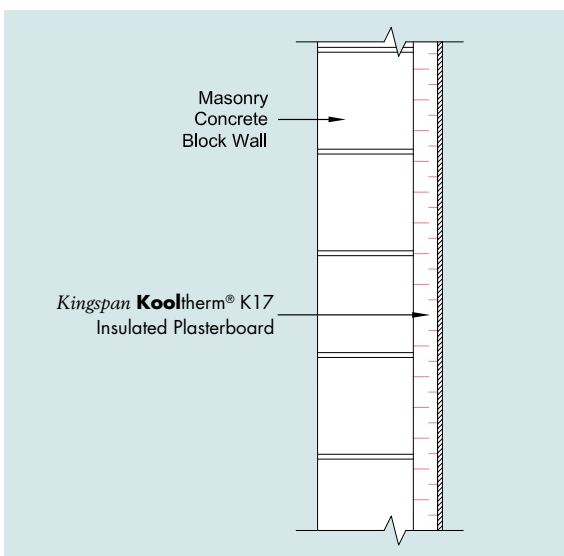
Side elevation - Masonry block wall with Kingspan Kooltherm® K17 Insulated Plasterboard
